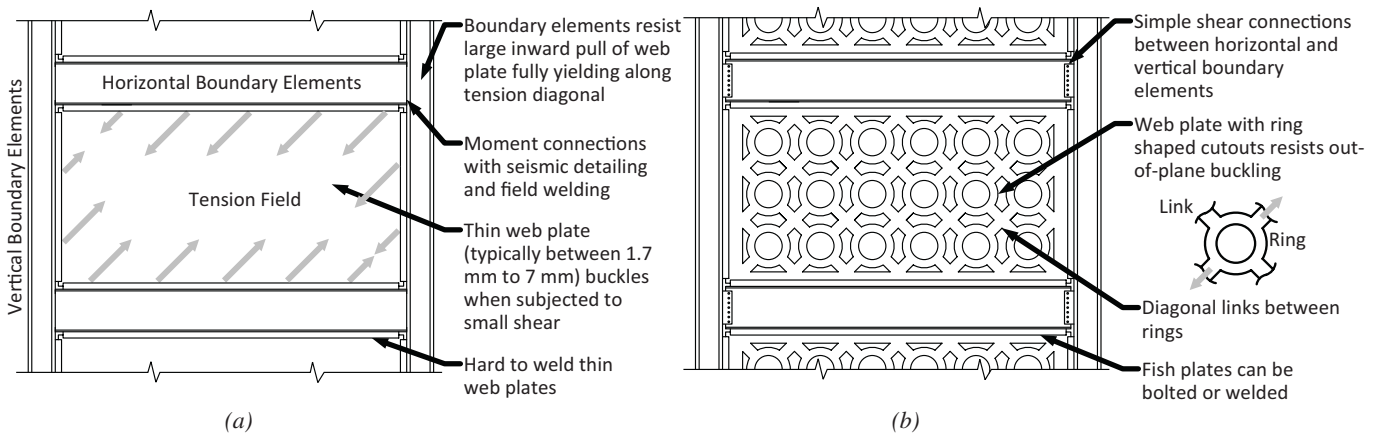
(a) Conventional steel plate shear wall (SPSW); (b) ring-shaped steel plate shear wall (RS-SPSW).
